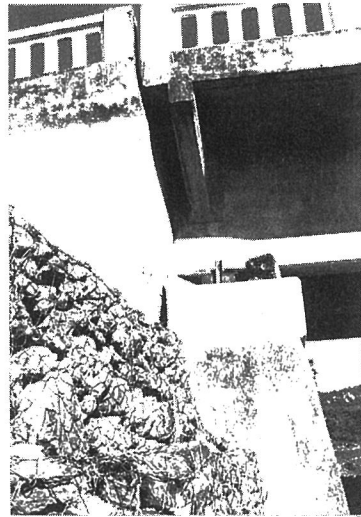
Tilting of an abutment at Gehari Bridge, Nepal
